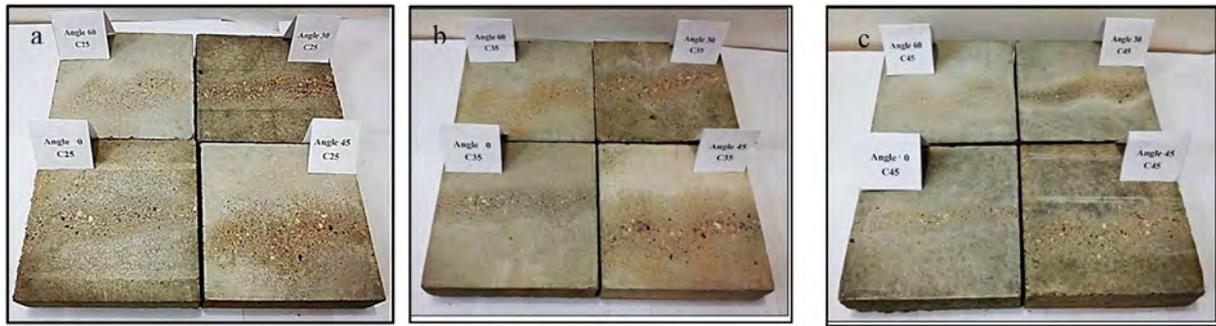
(a) Concrete specimen C25; (b) Concrete specimen C35; (c) Concrete specimen C45.
